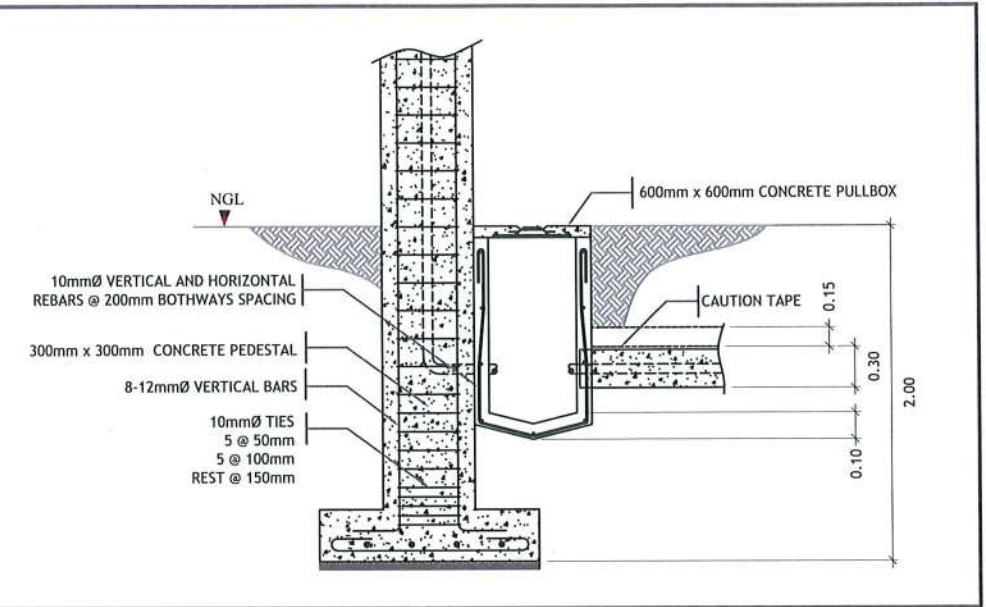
DETAILS OF ELECTRICAL CONCRETE PEDESTAL
